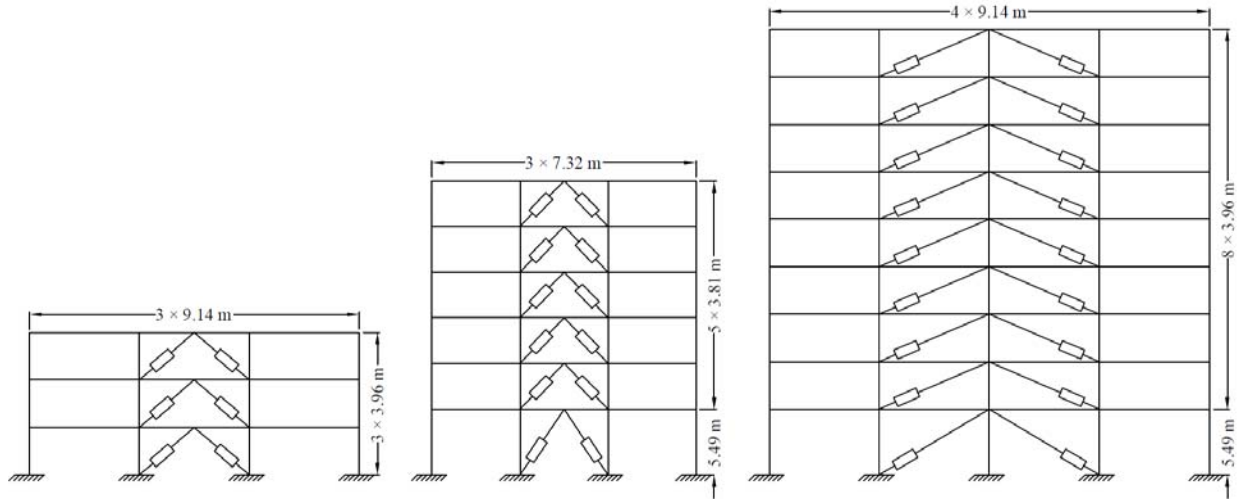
Elevation view of the selected steel frame buildings and configuration of viscous dampers
